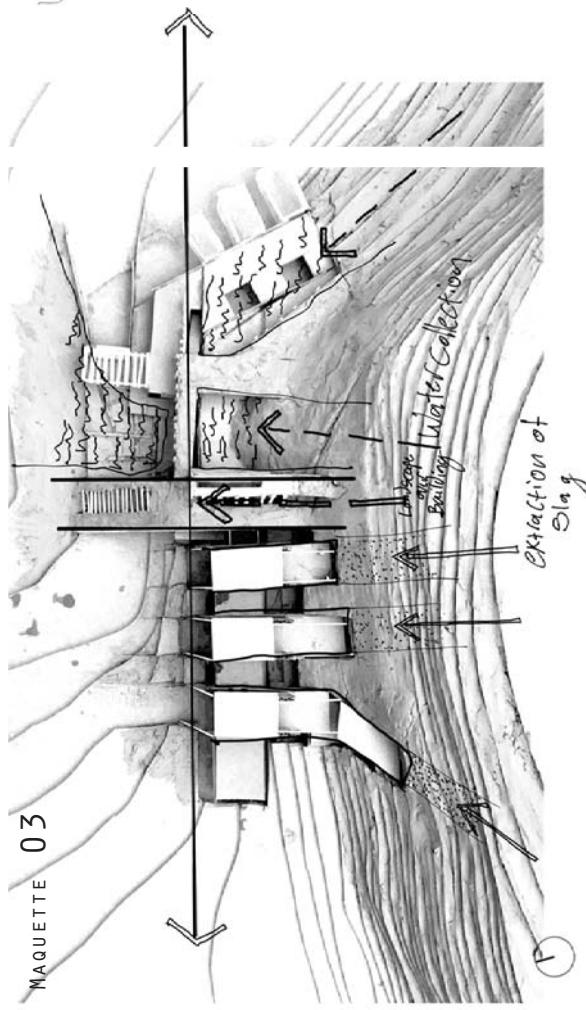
Sketch of iteration 03 plan. (Author, 2018)
